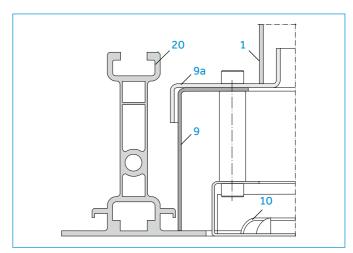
Installation situation with ceiling installation frame 9 and intermediate profile 9a in ceiling grid profile UFR 55/70 T/P
